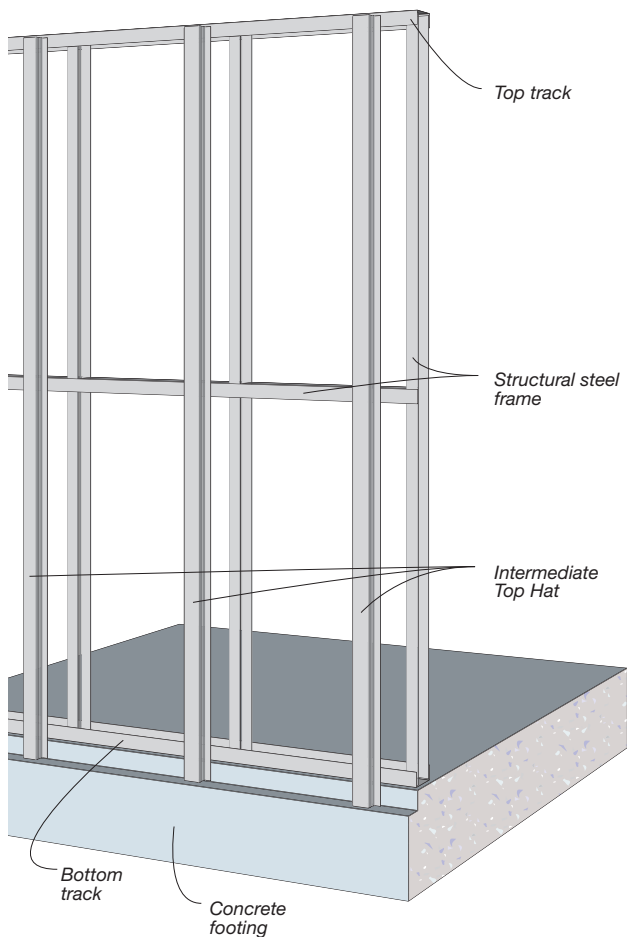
Fixing to existing masonry wallFIG 5. Fixing to Steel or Timber Stud Framing
